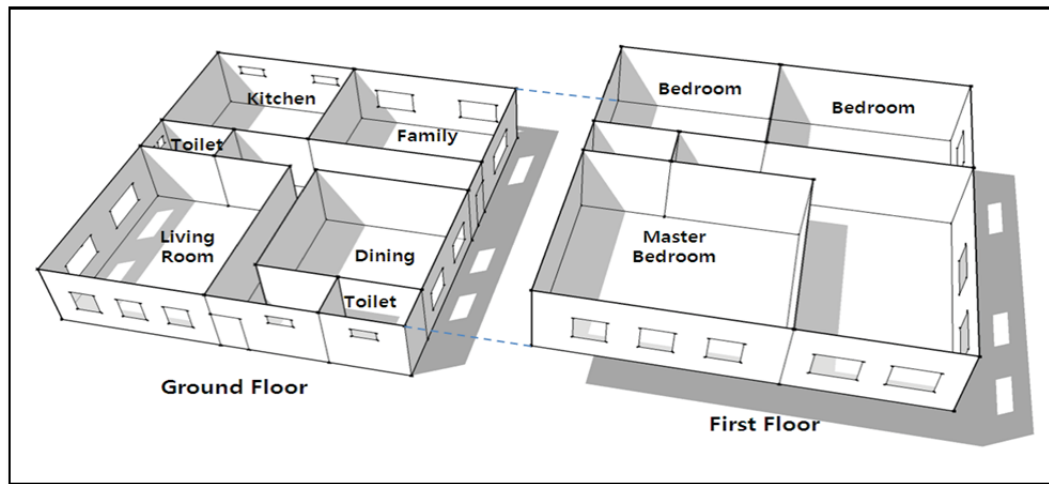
Layout and shape of a typical ground floor housing unit in Jeddah. (KAUST Industry Collaboration Program, 2013).
